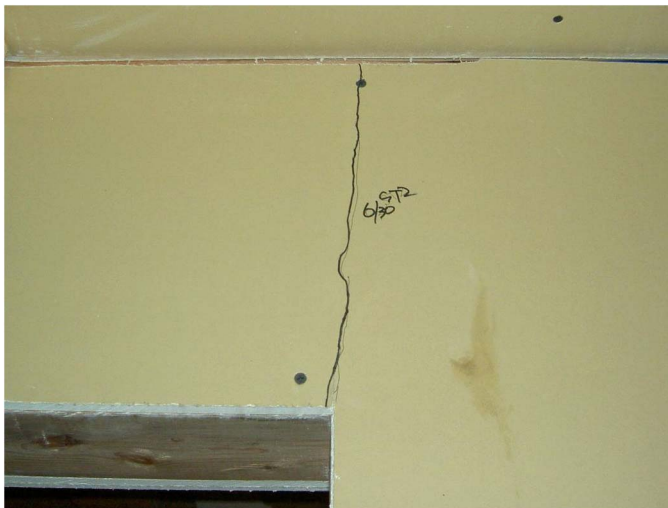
No new crack on Wall 2A, Story 7 (over door opening) after Seismic Test 3; the crack shown was developed during Seismic Test 2
